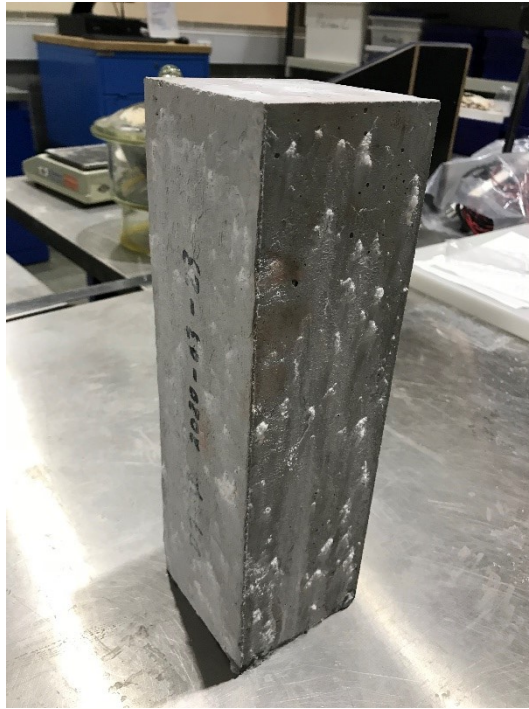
13 White exudation on surface of small-scale reinforced concrete beam after 2nd cycle of autoclaving
